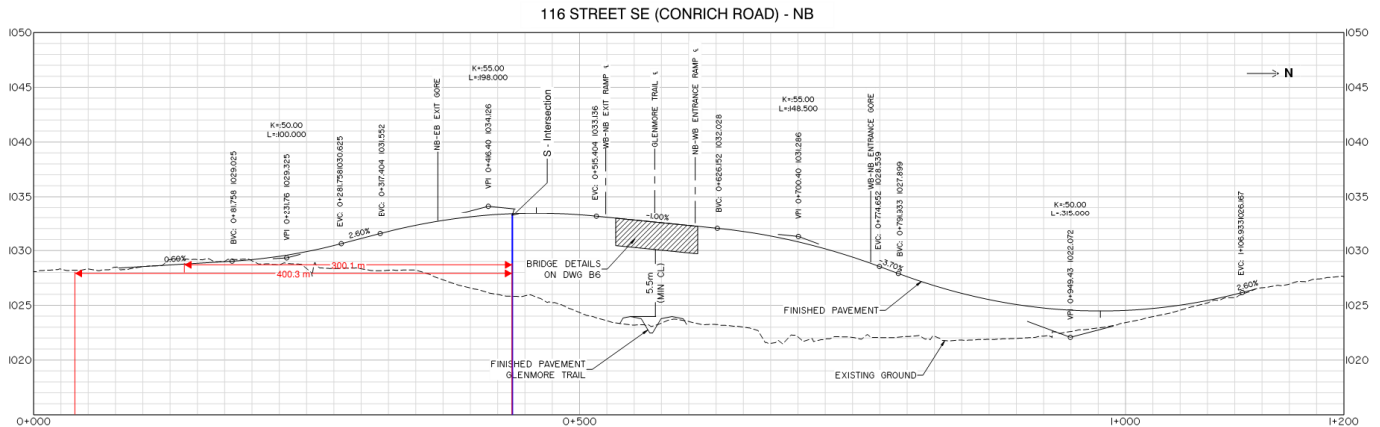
116 Street SE (Conrich Road) Proposed Northbound Road Profile
